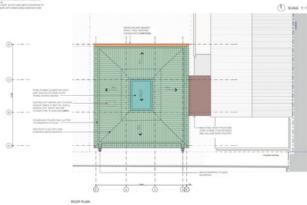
Proposed Roof Plan, NTS. Archer Office
